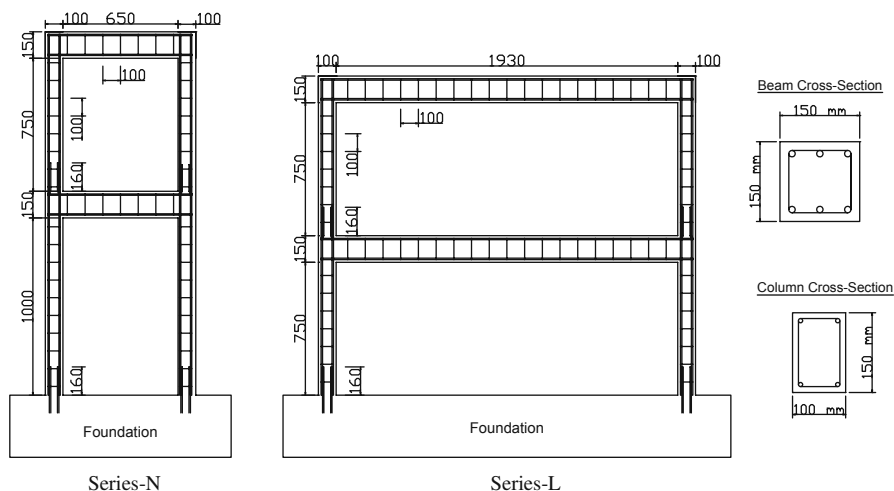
Dimensions and reinforcement details of the test specimens
